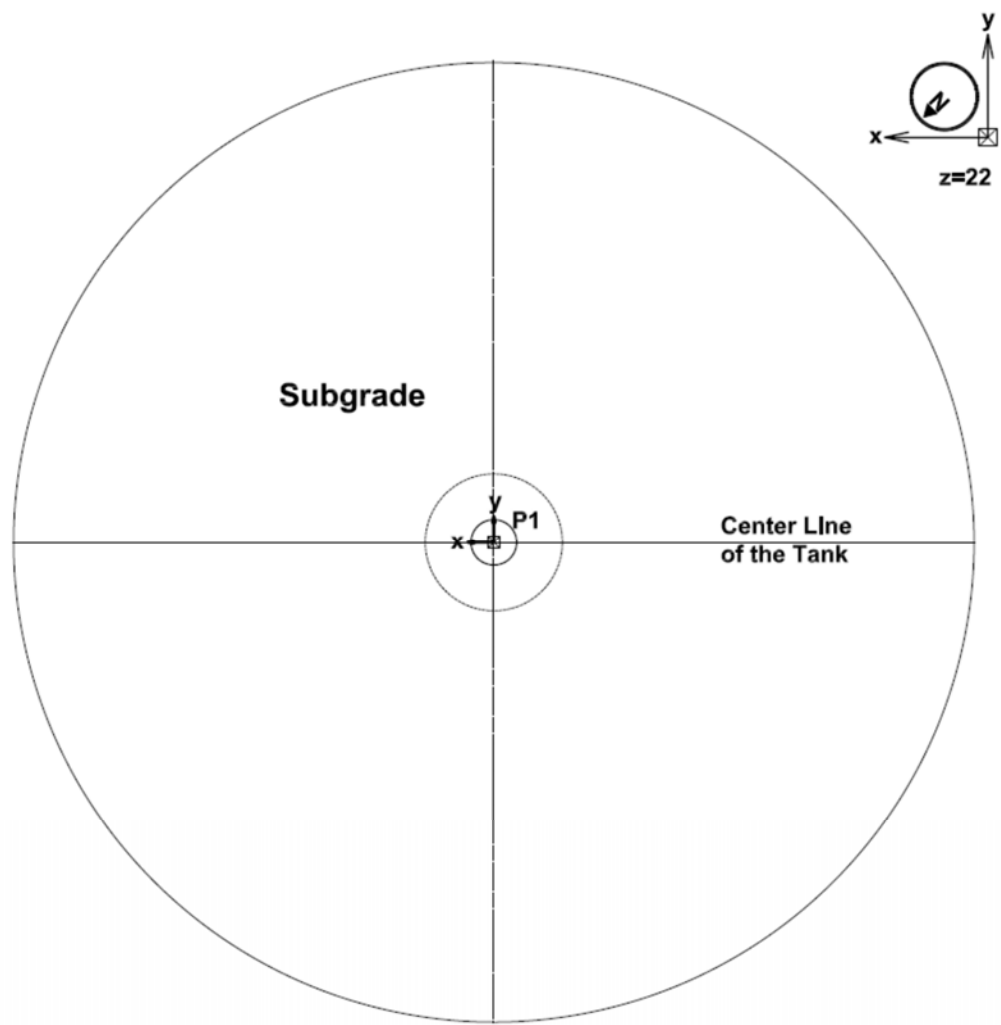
Instrumentation plan for experiment No. 2—Profile view, Z = 22 inches
